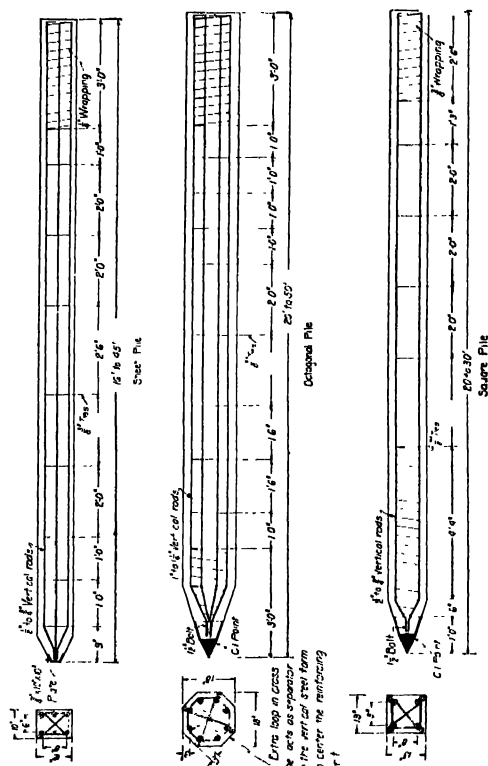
Details of piles used in ore dock construction at Cleveland.
